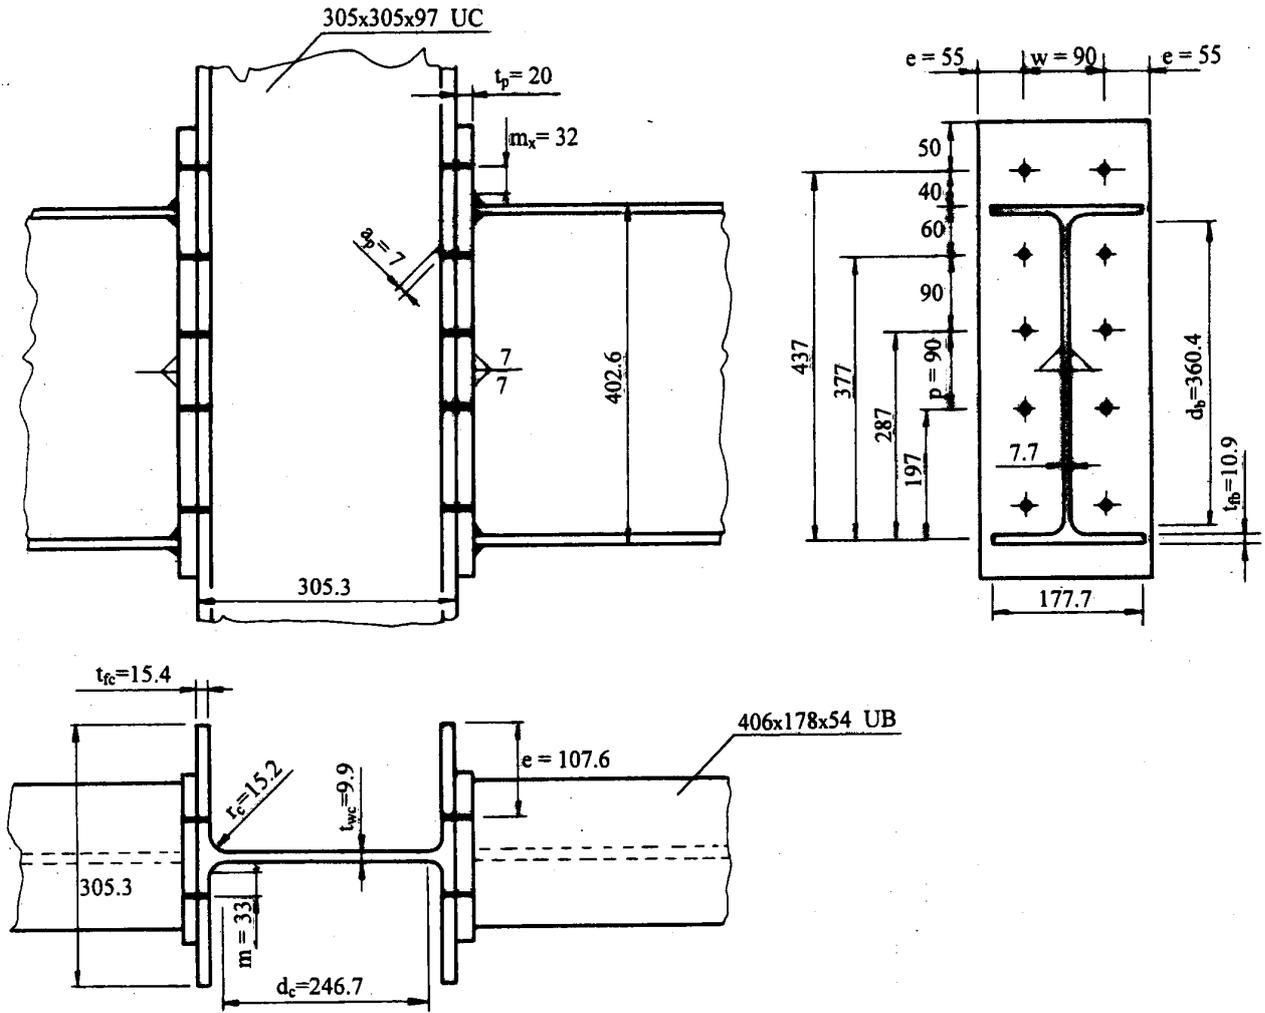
A double-sided bolted beam-to-column connection with extended end-plates
